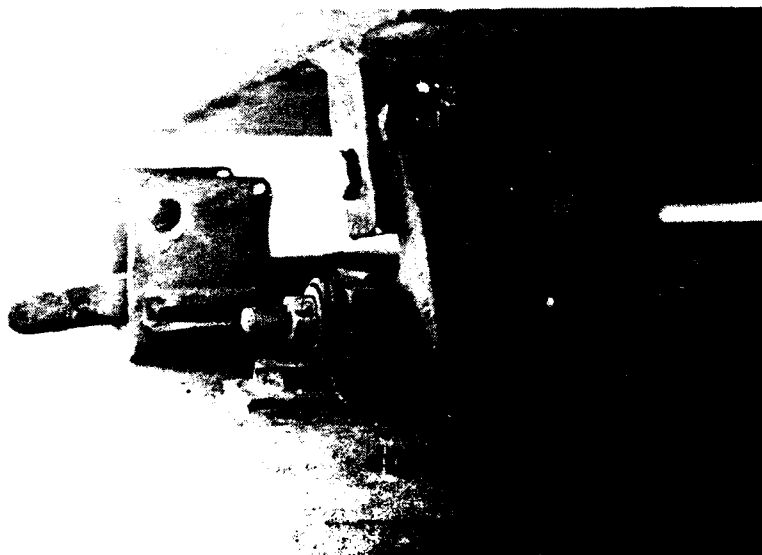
Mounting Hardware on Roof--Shows Signs of Hard Use But Remains Solidly Mounted
